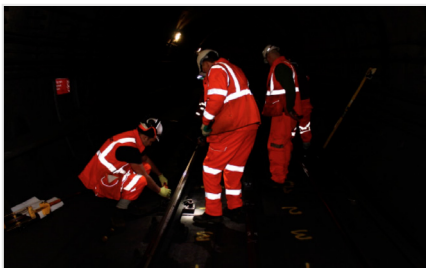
Disassembly and removal of baseplate pads from the Jubilee Line track
